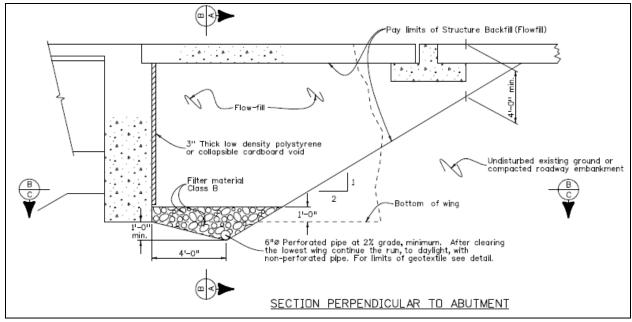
Colorado DOT specification to backfill bridge abutments with flowable fill
